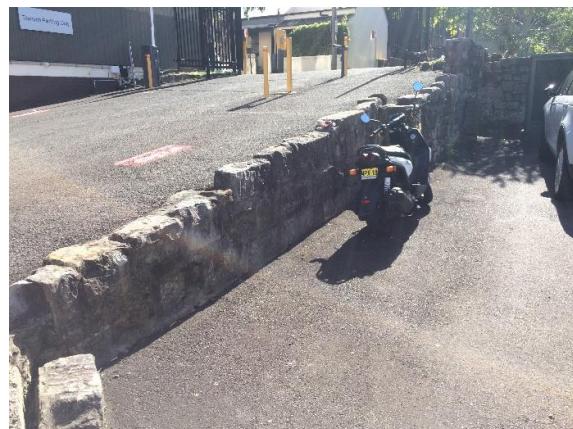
View of the brick retaining wall between the northern carpark and the warehouse building
